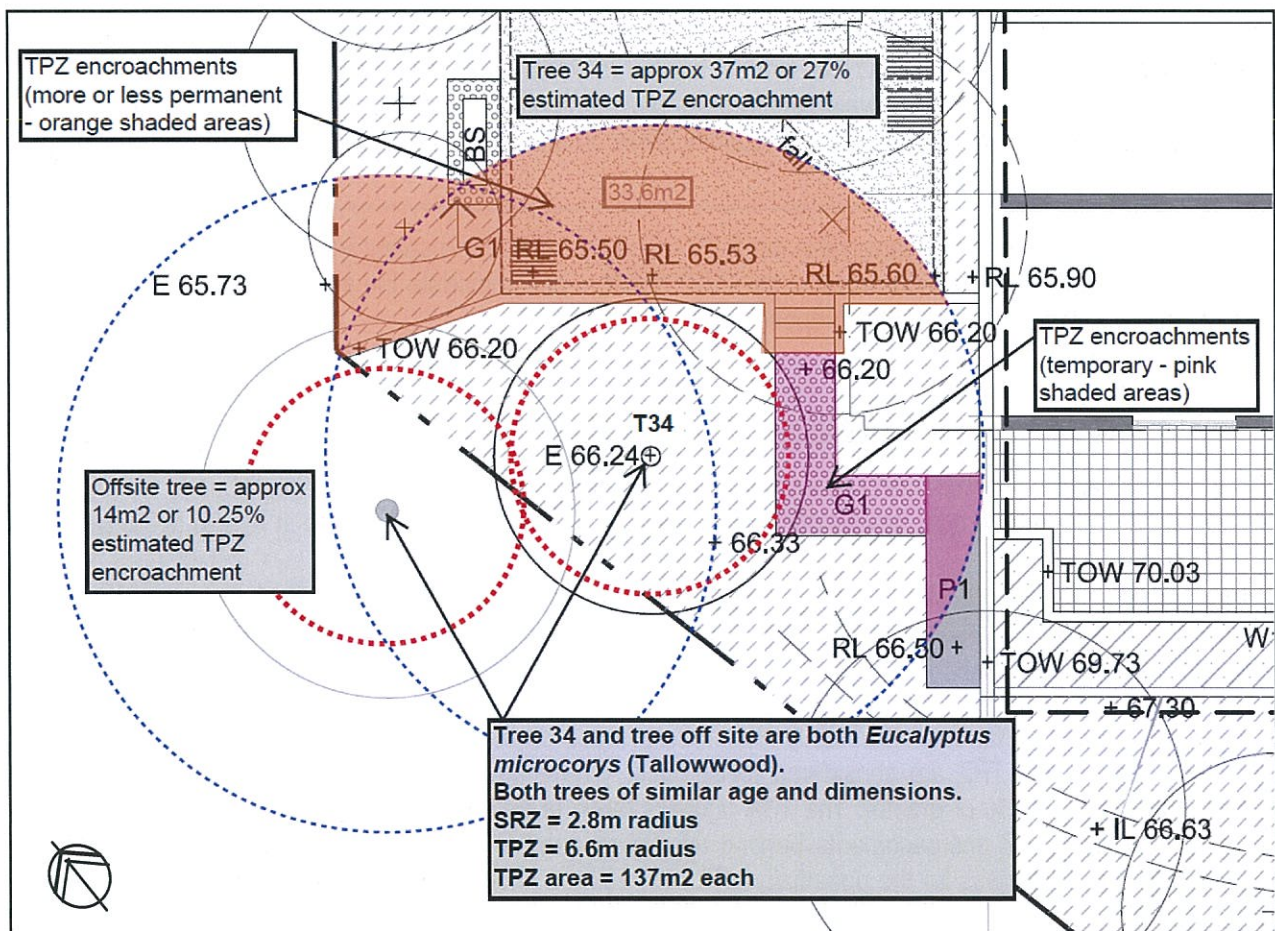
TREE LOCATION AND IMPACTS PLAN
